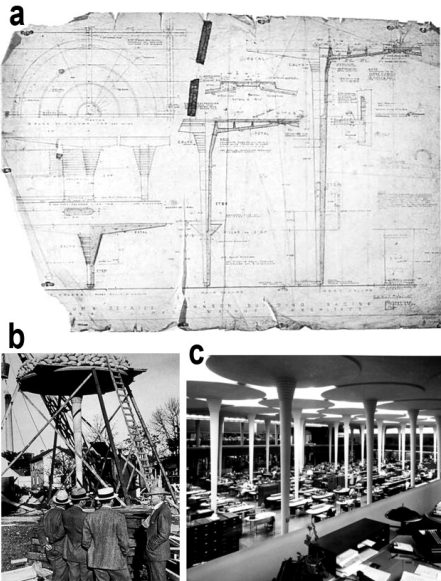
(a) Cross-section of the columns (b) Load testing on tubular mushroom column by F.L. Wright in 1938; (c) tubular mushroom columns supporting a glass ceiling, Johnson's Wax Building, 1939, by F.L. Wright (Lipman and Wright, 1986). © ScienceDirect
